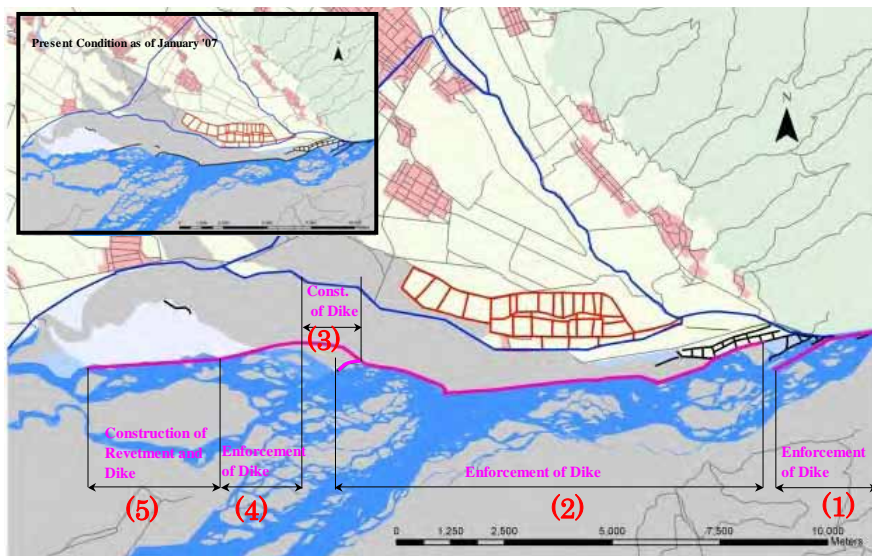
Diagram for Basic Plan for Long and Middle Term Plan
